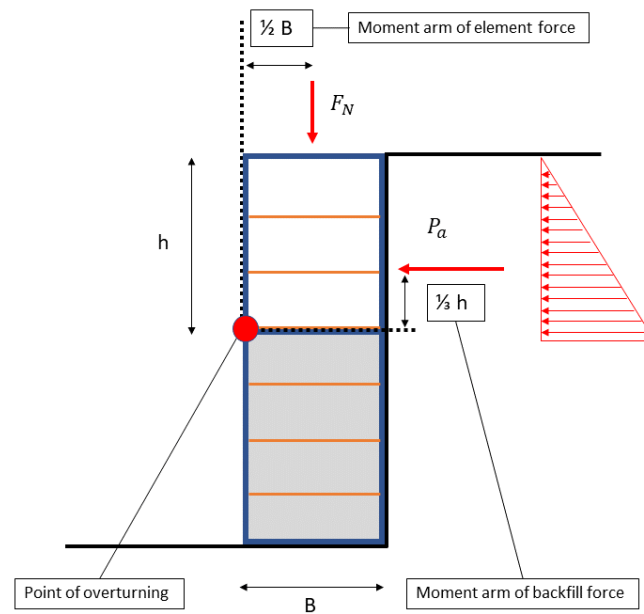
Local overturning of wall element, with its moment forces and arms.
